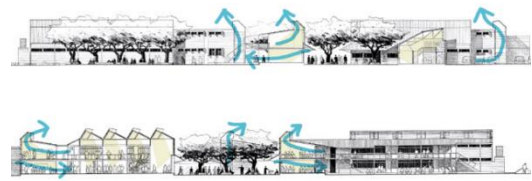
Sections through Usasazo Secondary School indicating natural ventilation and natural lighting, 2004, Khayelitsha (Wolff Architects, 2024:online).
